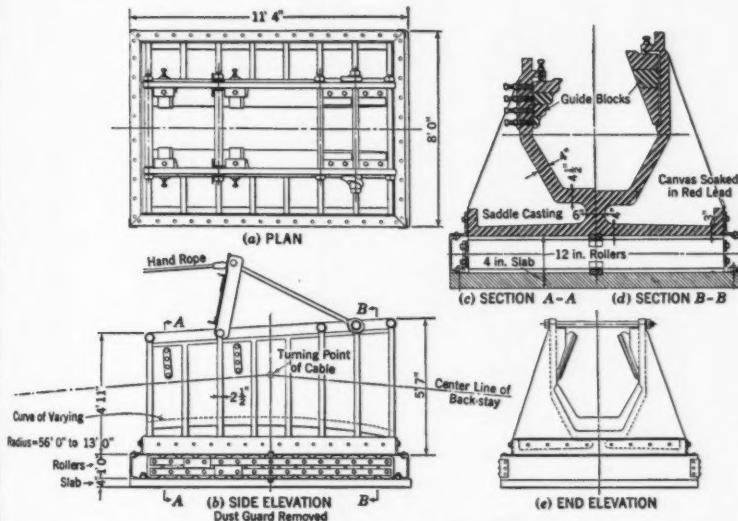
DETAILS OF ANCHORAGE CABLE SADDLE.
